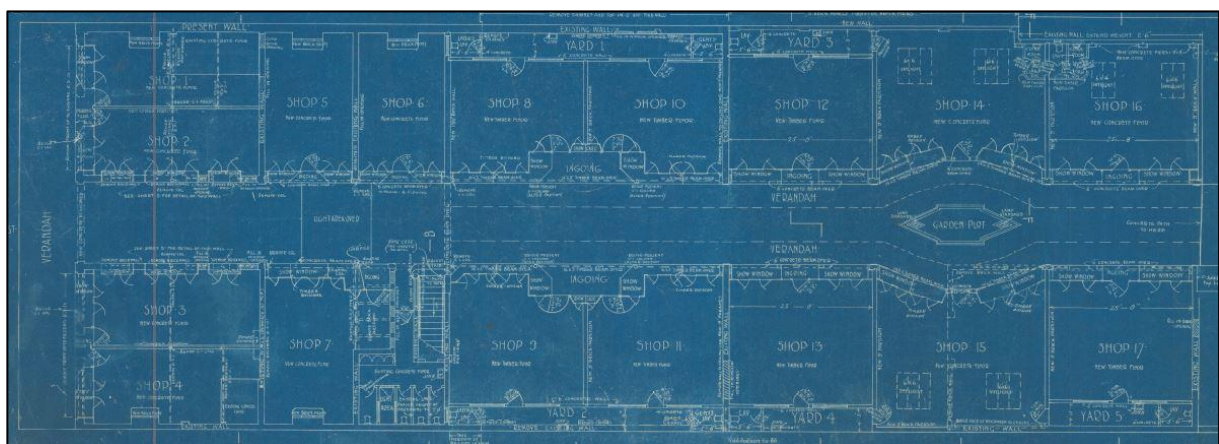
Detail from 1933 plan showing original ground floor layout of Esk Street end of arcade (Esk Street to left) (Ford, 1933).
